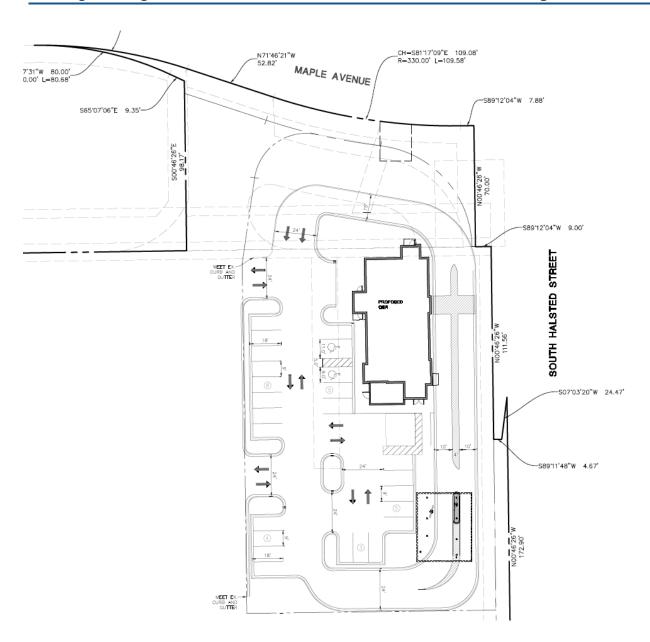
Conceptual site plan drawing submitted by the applicant, showing a potential scenario for a quick-service restaurant (QSR).
